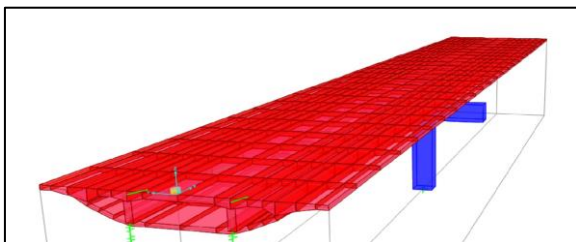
Multi Cell Box Girder of Exterior Girders Slopped Maximum
